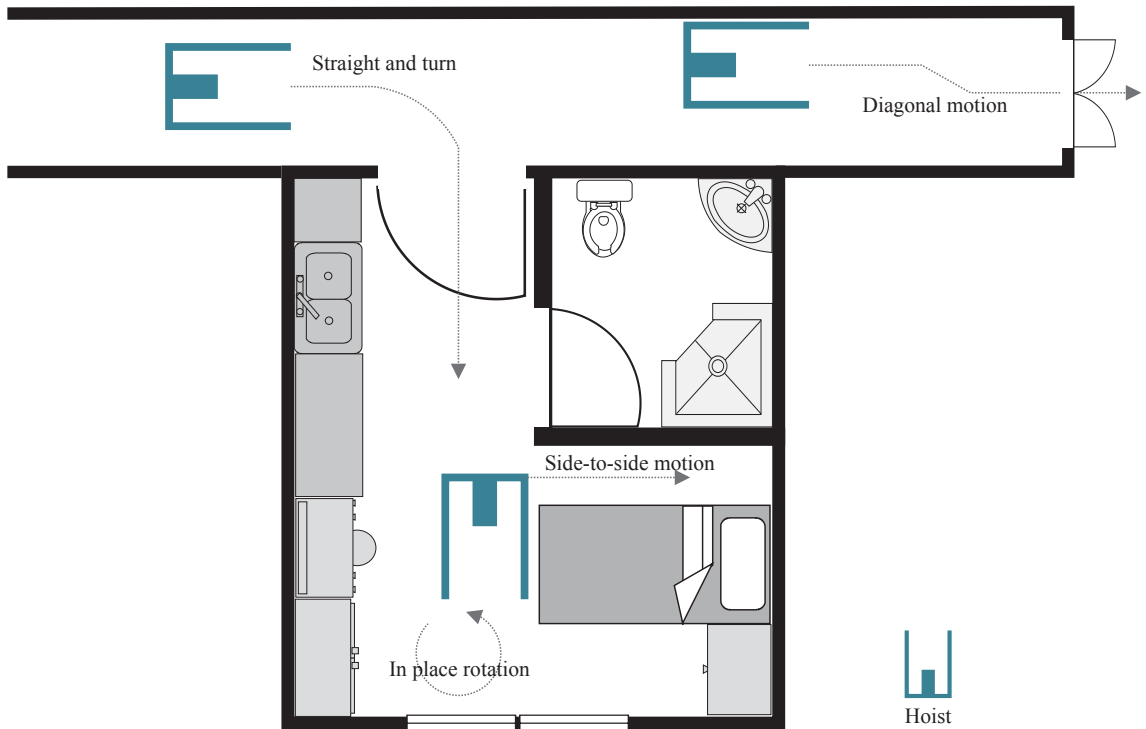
A typical floor plan of a resident's room at the IRT Woonona care facility.
